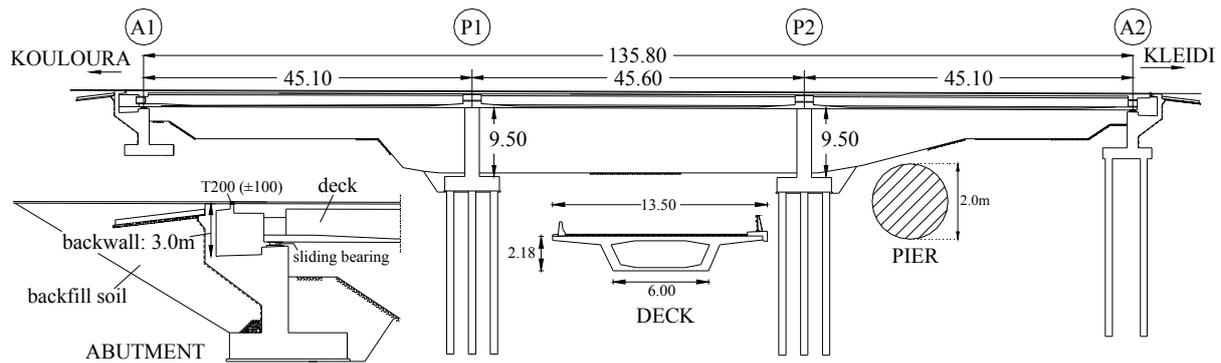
Longitudinal section of Kleidi-Kouloura bridge and the cross sections of the abutment, the deck at the mid-span and the pier.
